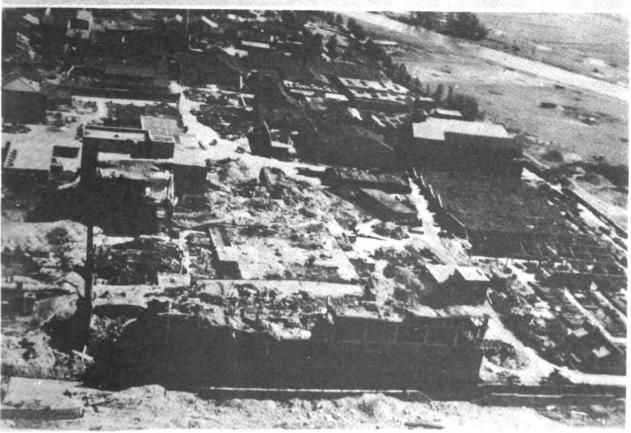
VKF II - Ball Bearing Plant. Aerial view looking south at 400 ft. showing plant area and buildings. Plant as it appeared in May 1945 includes only the area south of road.
